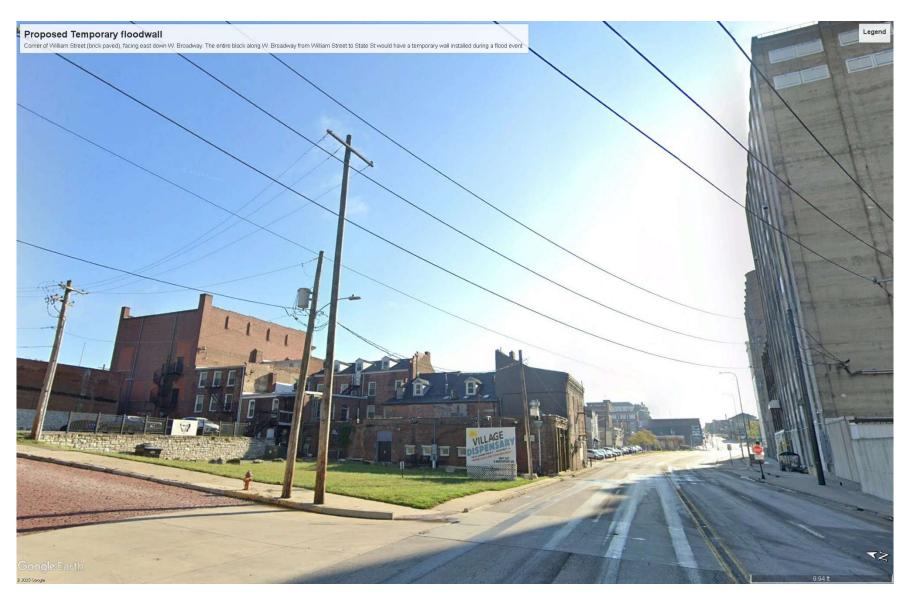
Proposed Temporary Floodwall along West Broadway from the corner of William Street to State Street; facing east
